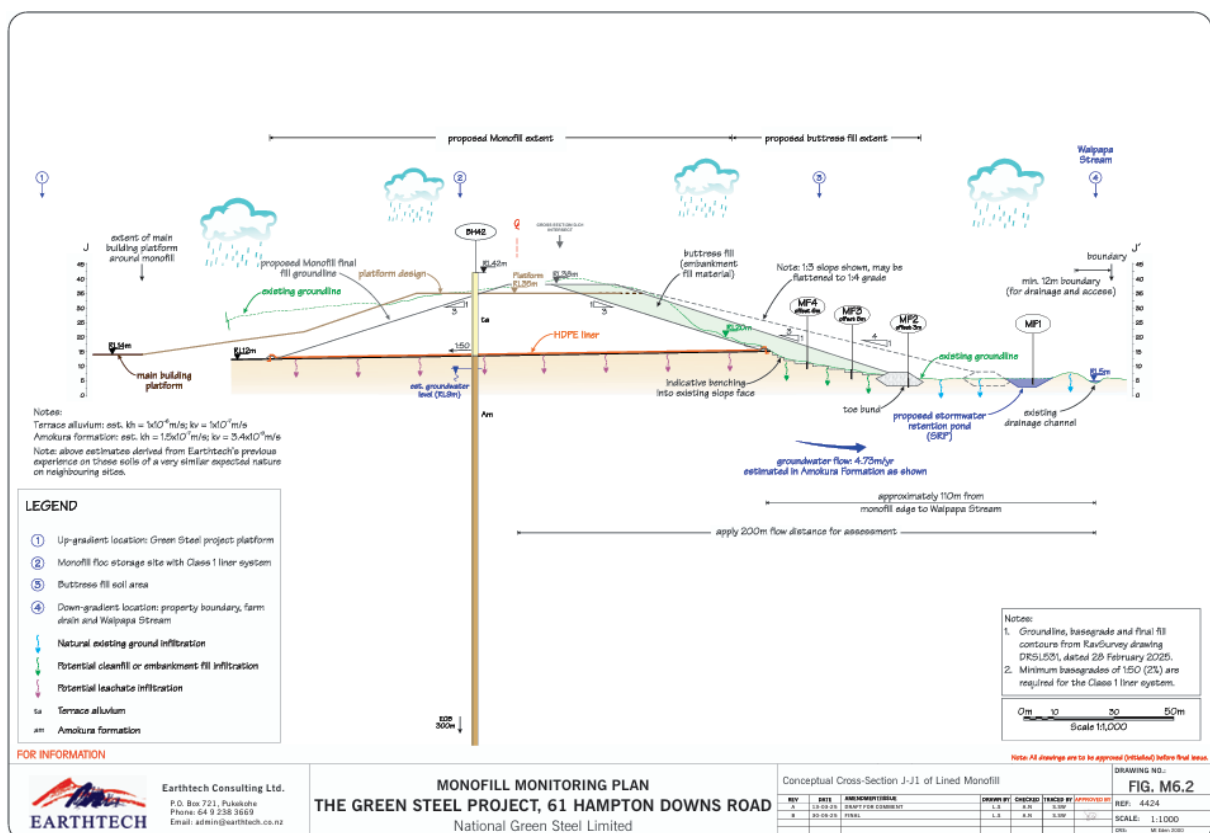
Proposed Northeast Monofill Indicative Cross Section (Source: Earthtech Report Attachment 17)
